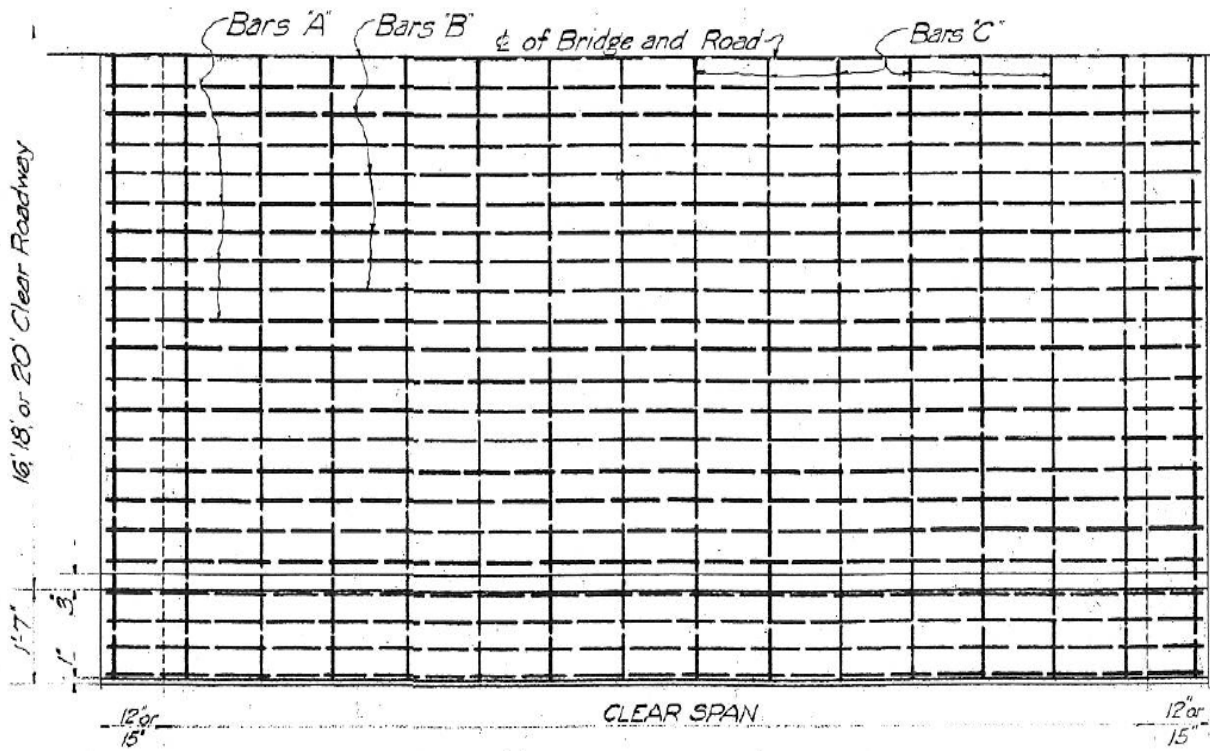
Details of Bars A, B, and C Configuration in a Section Cut for SHDA (1922)
